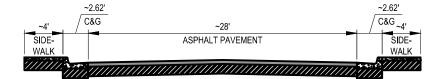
EXISTING TRUMBULL AVENUE TYPICAL SECTION
